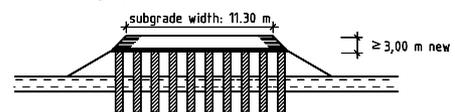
Solution used for the embankment upgrading at Niederung Harper Mühlentbach
